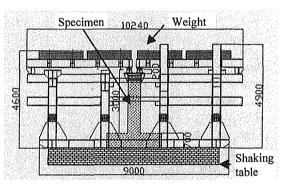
Specimen of jacketed RC bridge pier⁶⁾
